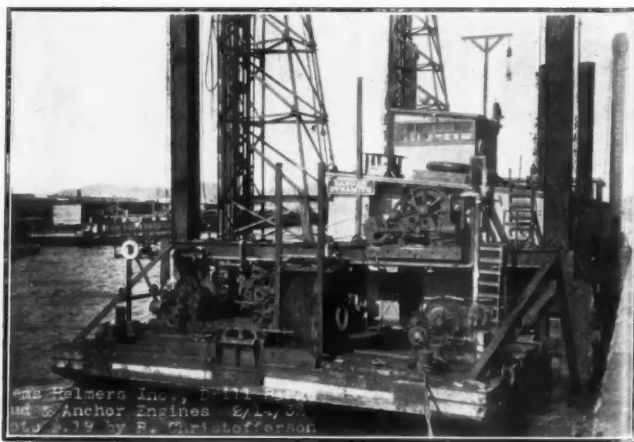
View of Drill Boat, showing Spud and Anchor Engines.
